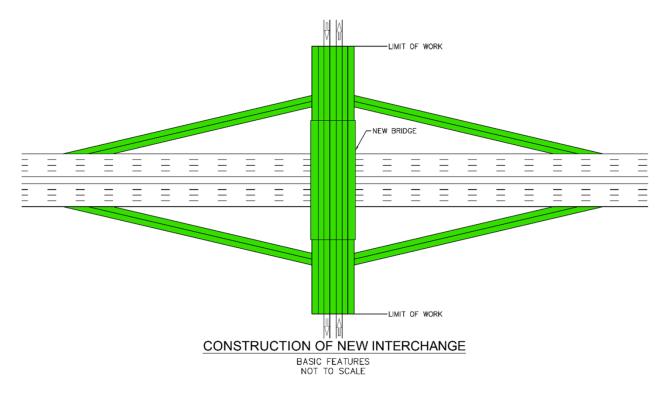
Typical Configuration – Construction of Interchange Improvements
